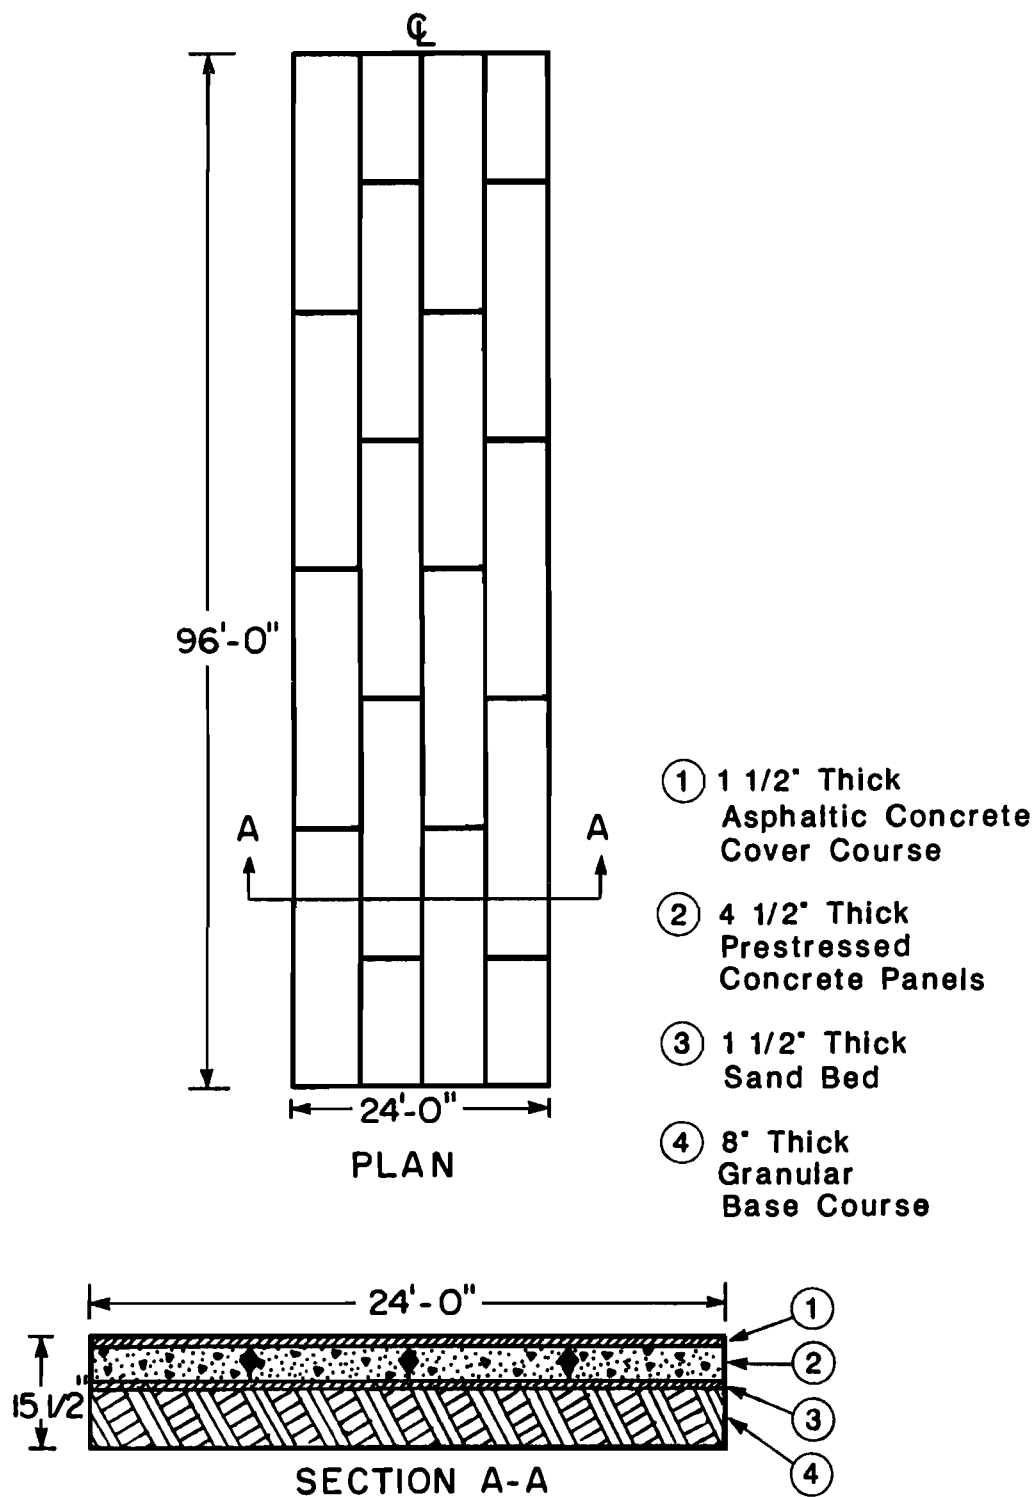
Panel arrangement and composite pavement construction (Ref 57).
